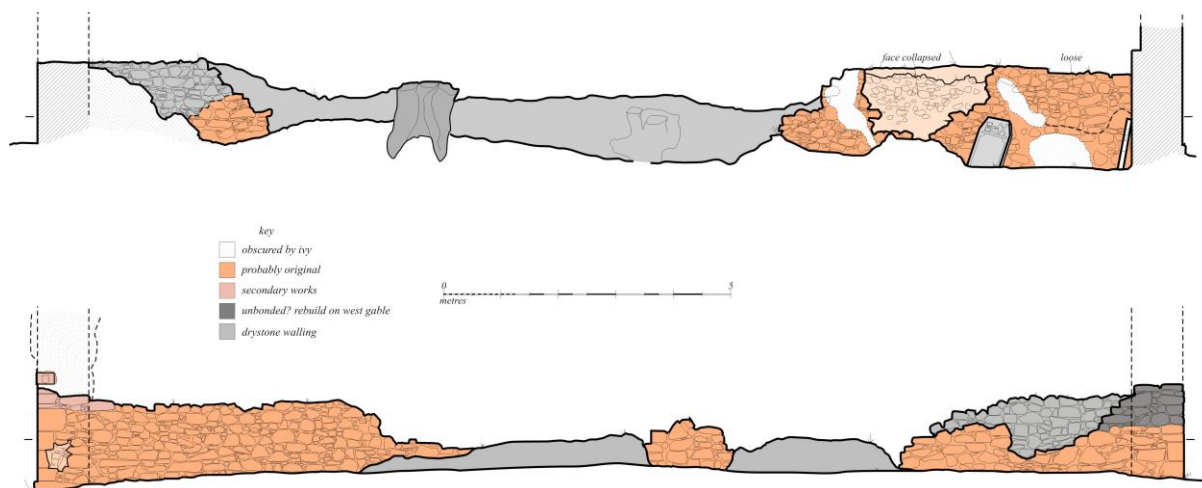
North elevation interior and exterior with suggested phasing (orange – extent of original fabric)
